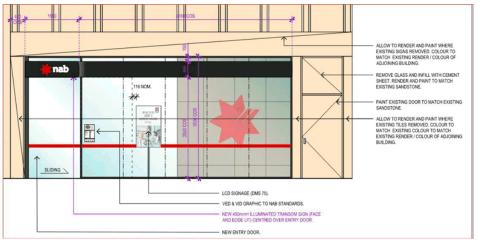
three new (discretionary) window signs located on the building's facade facing the Elizabeth Street Mall
